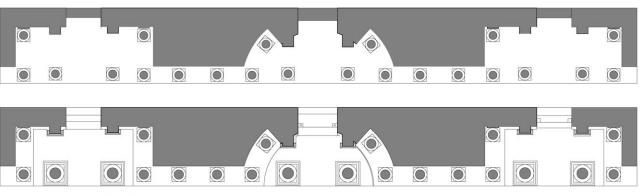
Reconstructed plan of the scaenae frons (above, second story; below, first story)
